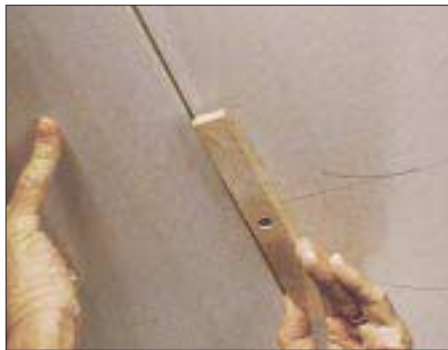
The author uses shop-made “lead and follow” blocks to support ceiling drywall while it’s being screwed in place. The blocks are screwed into the joists and rotated out of the way while the drywall sheet is lifted into place. When the sheet is in position, the blocks are rotated to temporarily support the sheet. Below: Lead (left) and follow (right) blocks in action.
